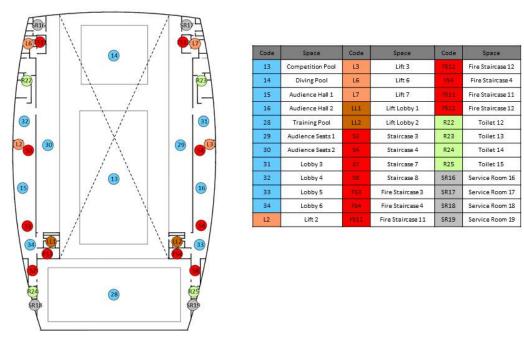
Second Floor Plan with SOA. (Drawn by Goh Zhen Yi. Source: Archdaily,2019)
